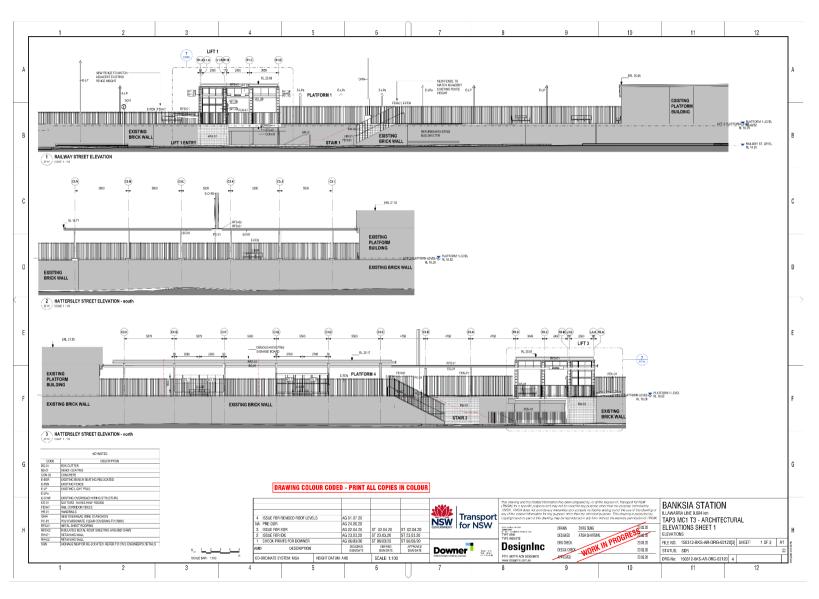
Banksia Station architectural elevations – Sheet 1
